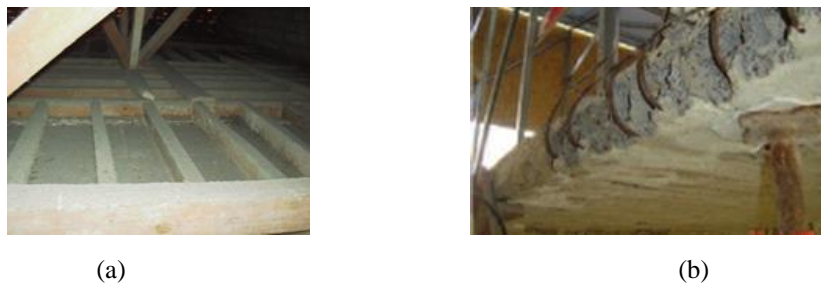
Examples of floors (Mauro and Bento, 2012): (a) Timber floor on the roof, (b) Concrete slab
